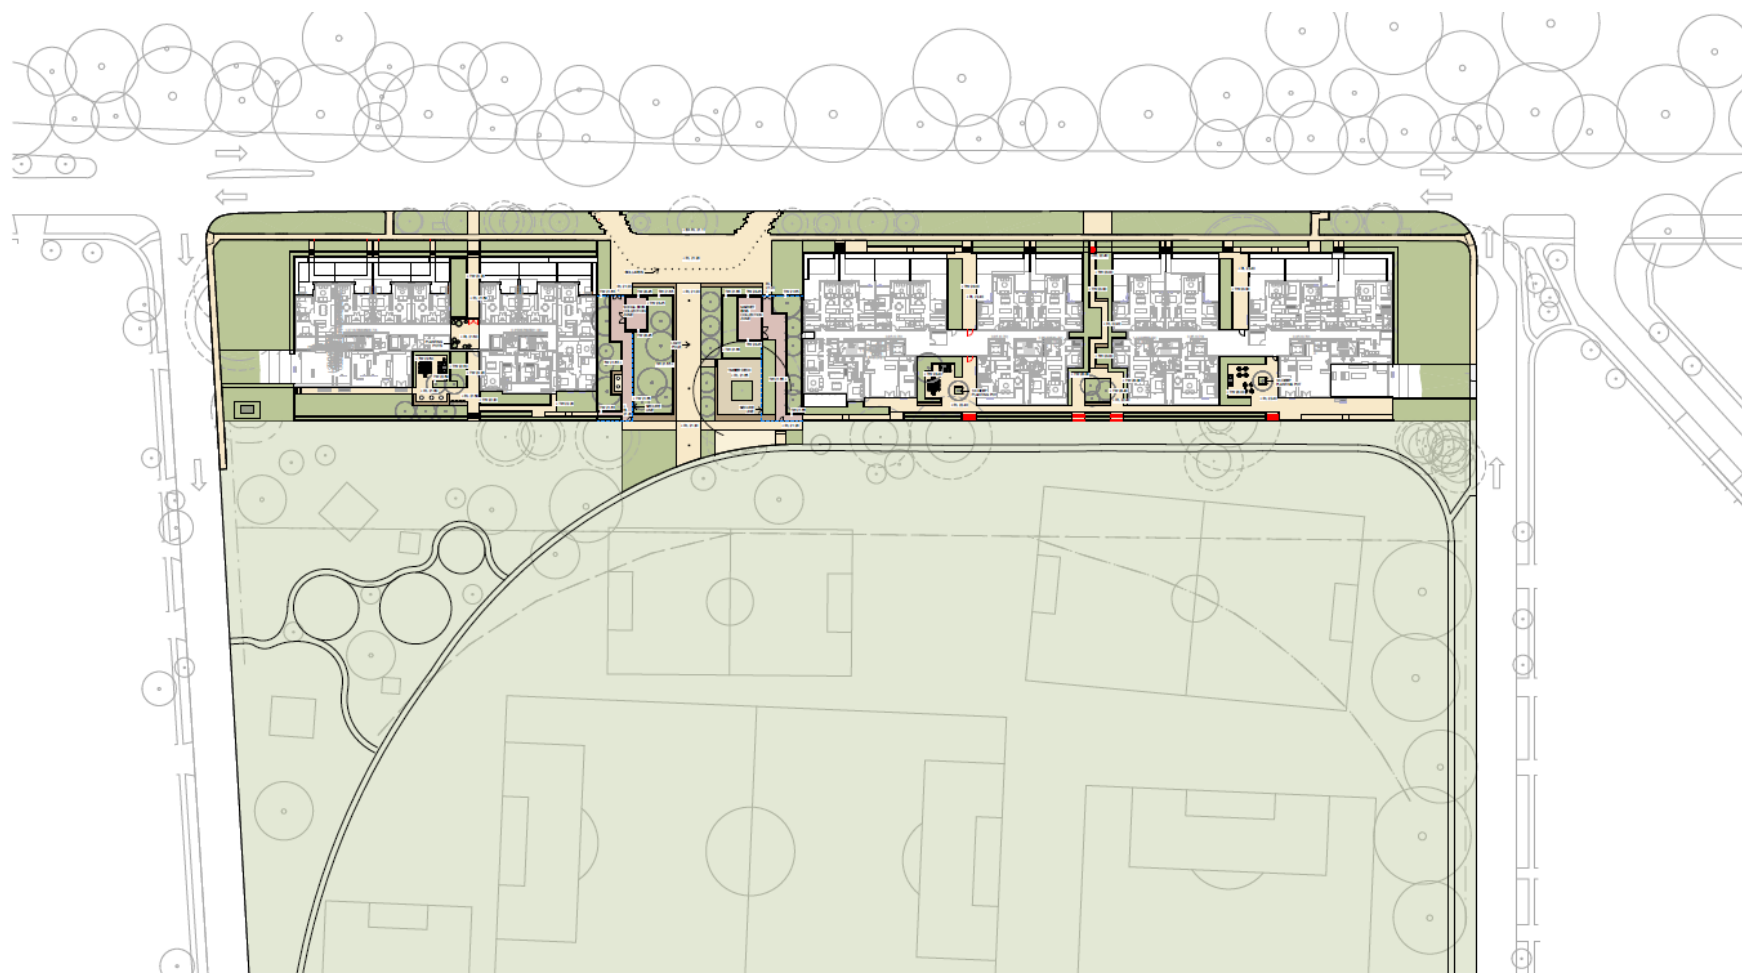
General arrangement plan. Source: BVN Architects October 2025
